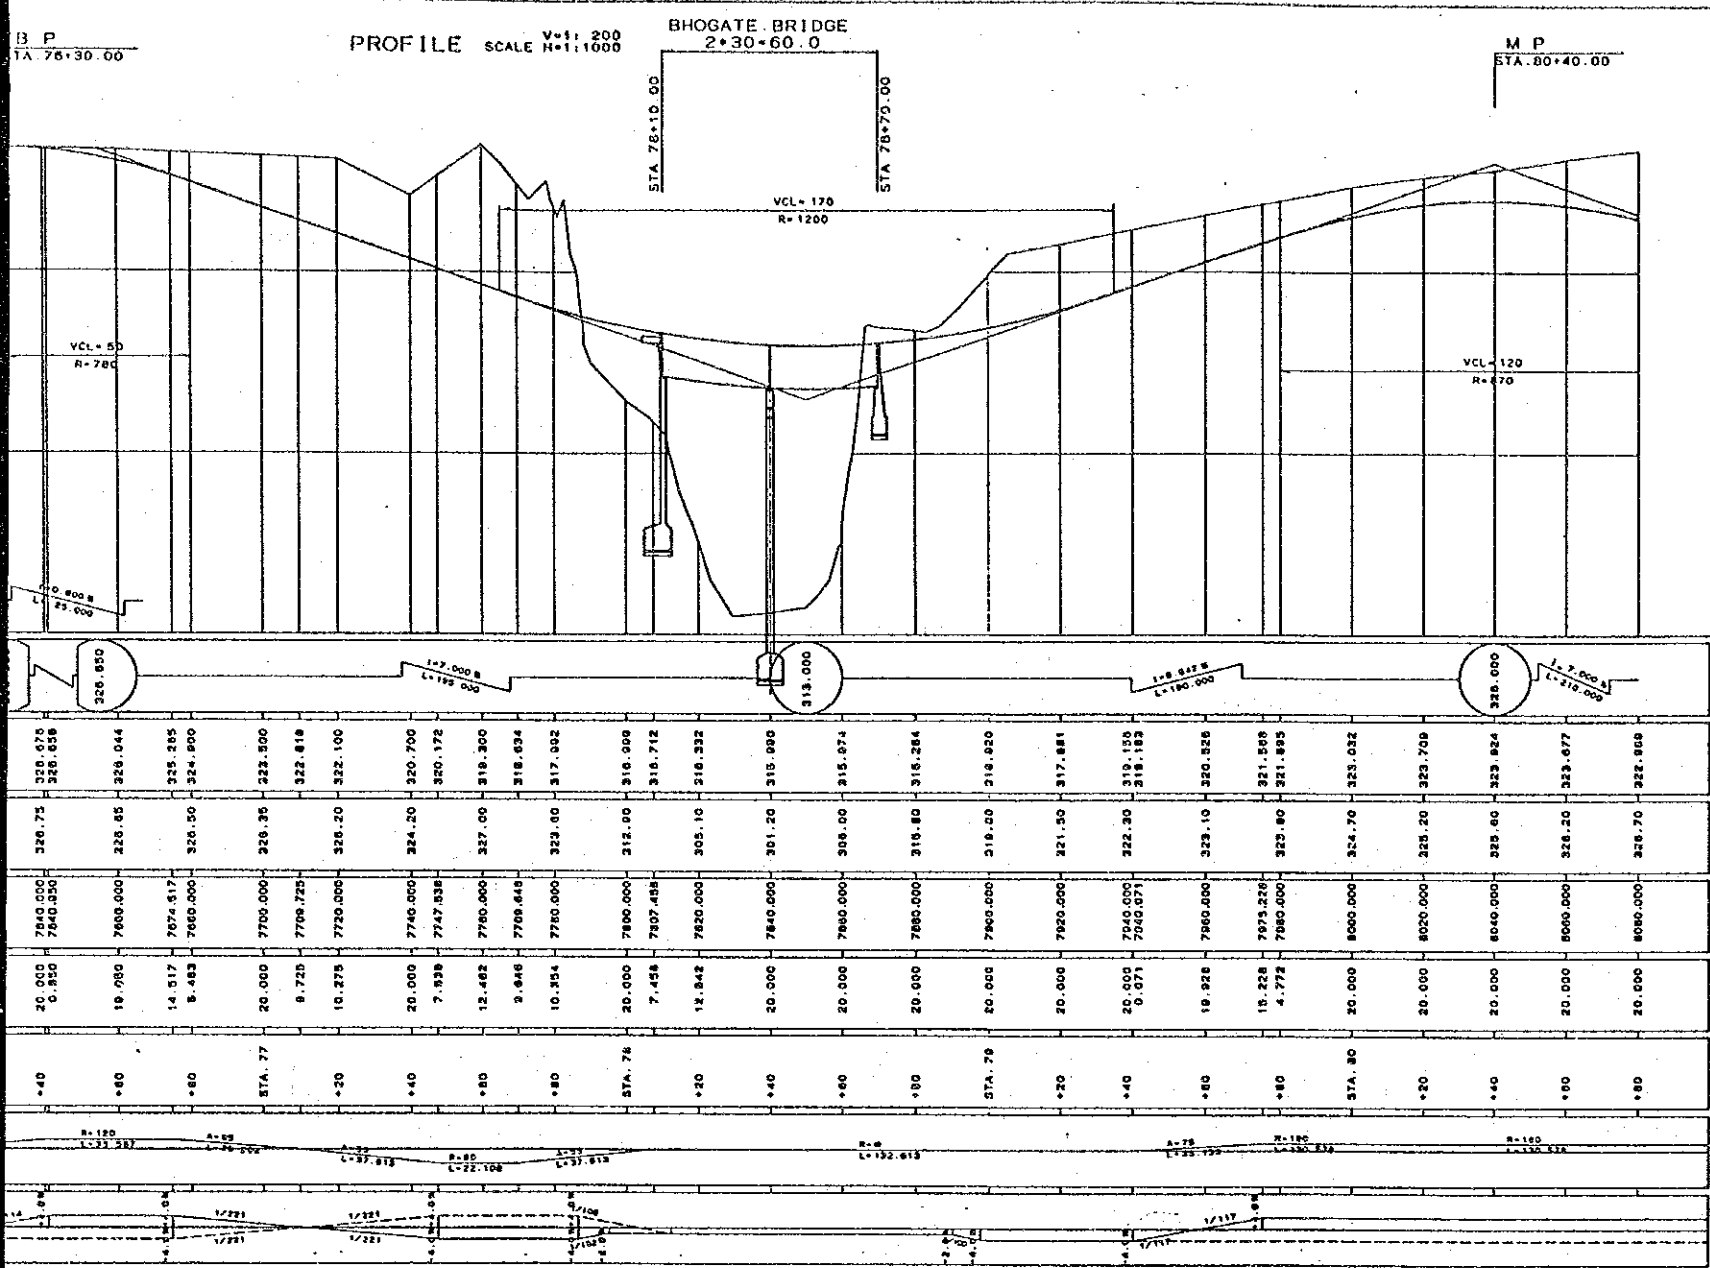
Plan and Profile of Approach Road for Bhogate Bridge
